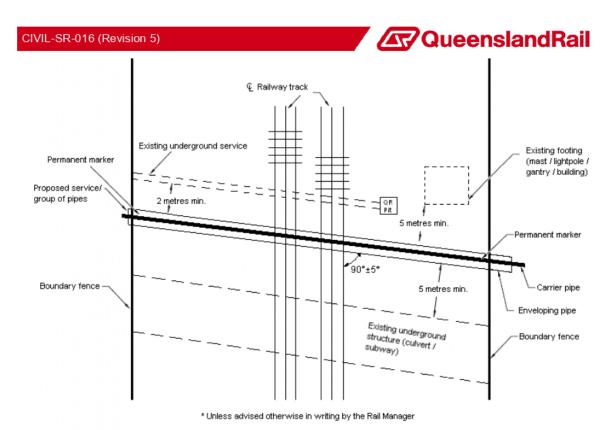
Plan Showing Service Pipe Crossing the Railway Corridor
